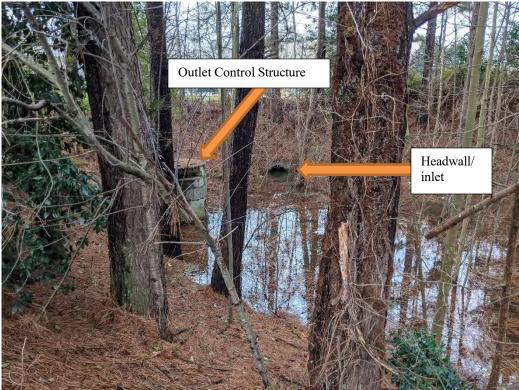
View of SW-K15 (outlet control structure) in detention pond located on southwestern portion of Town Point.
